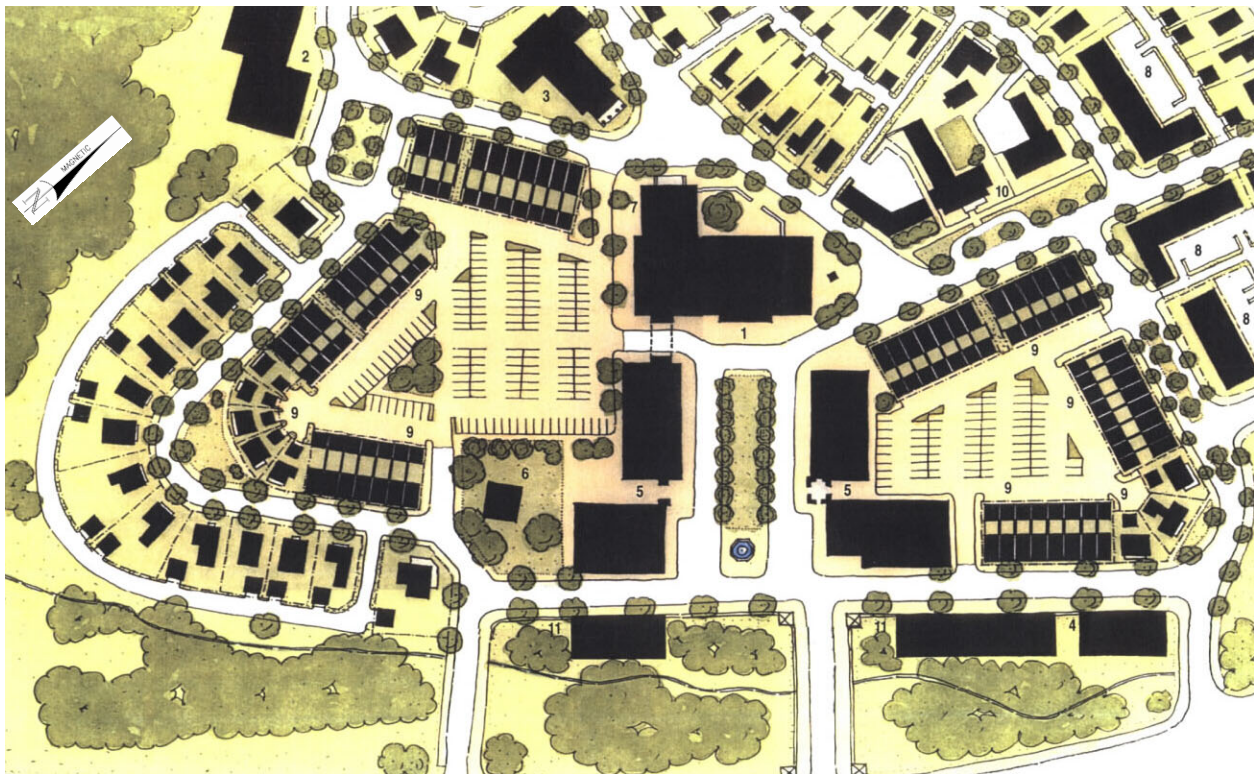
T-5 Site Specific Plan by DPZ & Co..
